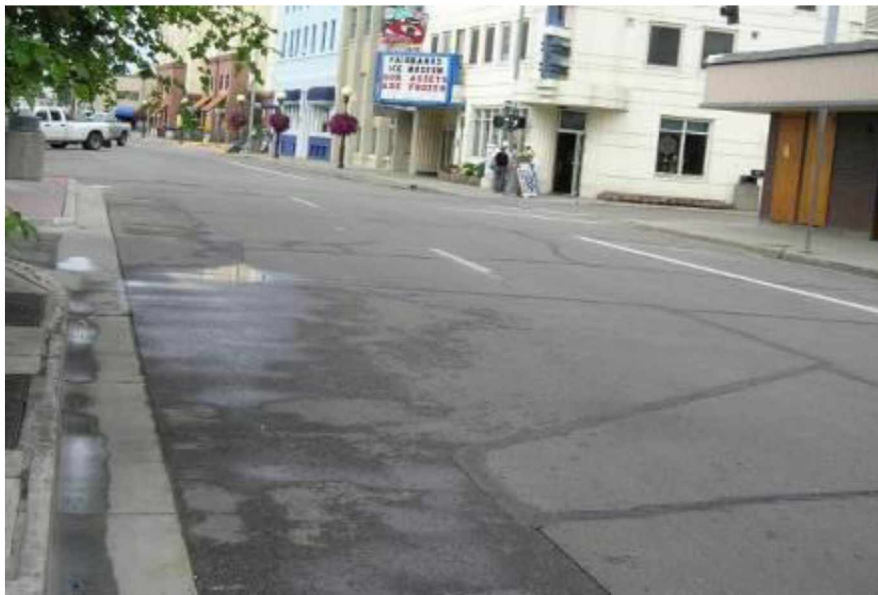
2nd Avenue, Fairbanks, crack seal, thermal cracking, 2011.
